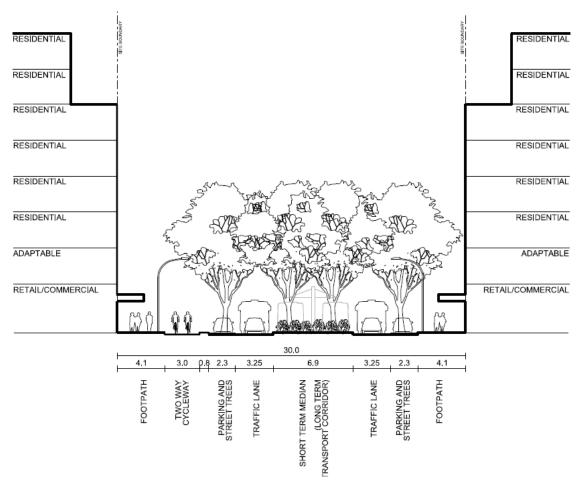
Section A – Transport Corridor Typical Section (short term arrangement) – 30m (Gadigal Avenue)
